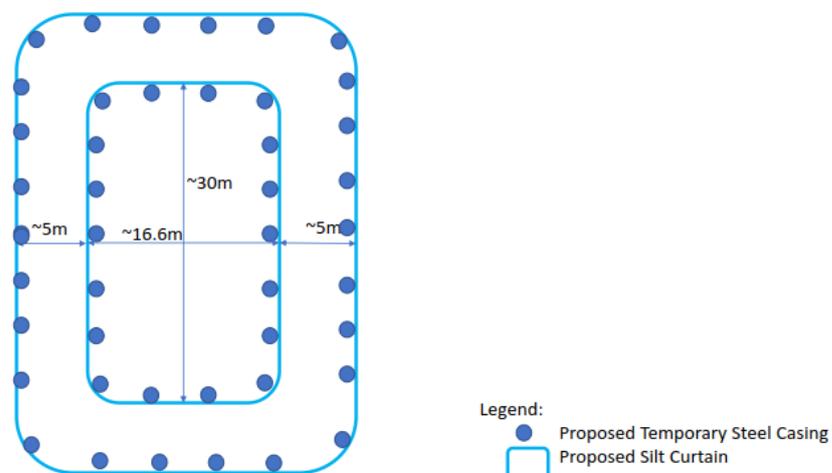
Indicative Arrangement of Enhanced Silt Curtain Barrier (Plan View)
